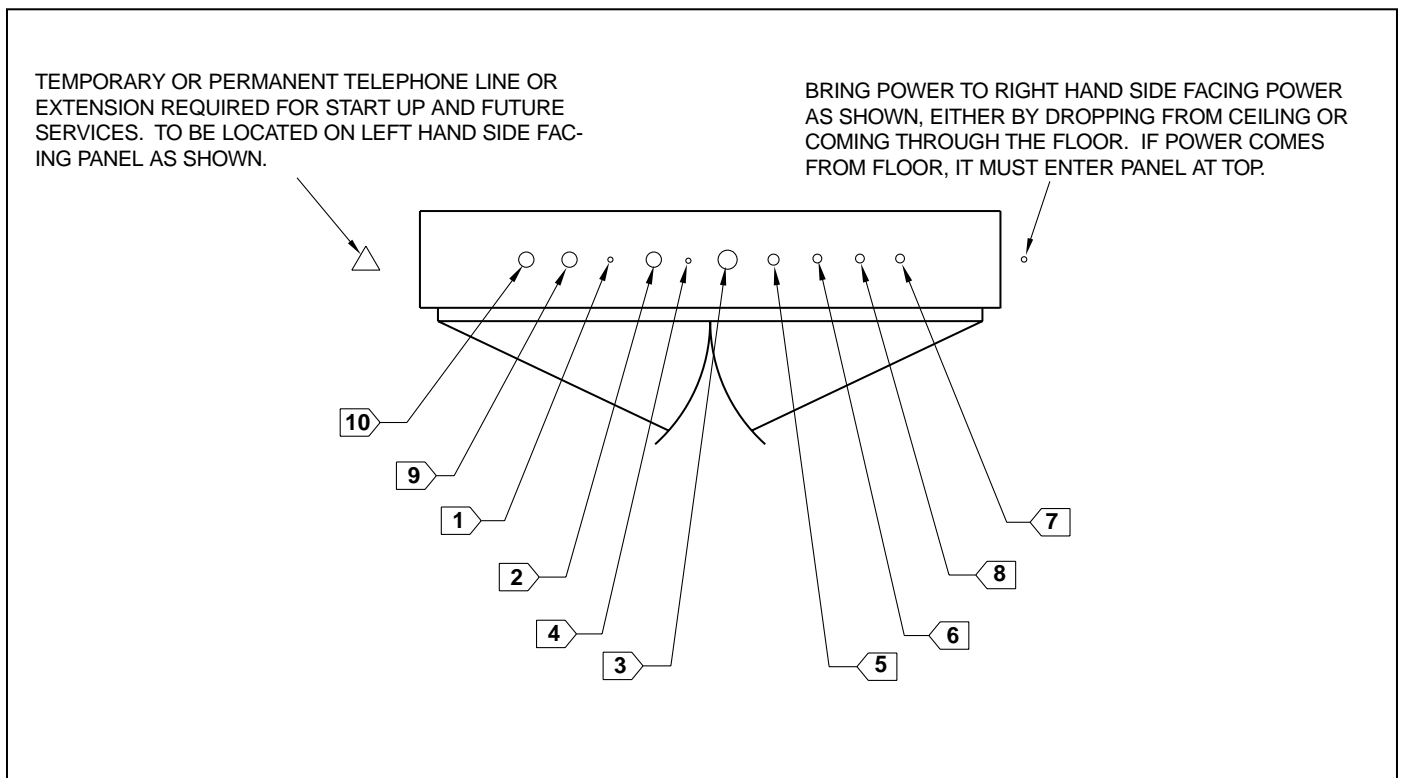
MS-12 BESSER-MATIC ELECTRICAL PANEL CONNECTIONS (ref. installation sheet 2).
